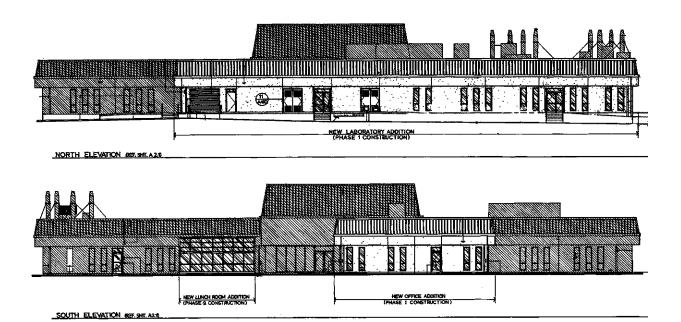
Admin/Lab Buildings – North (top) and South (bottom) Elevations
